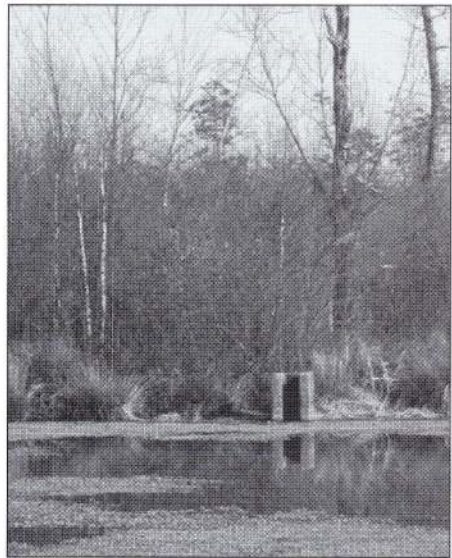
Concrete outlet structures facilitated drainage in newer ponds. Most of these structures have now been replaced with modern polyvinylchloride standpipes.
